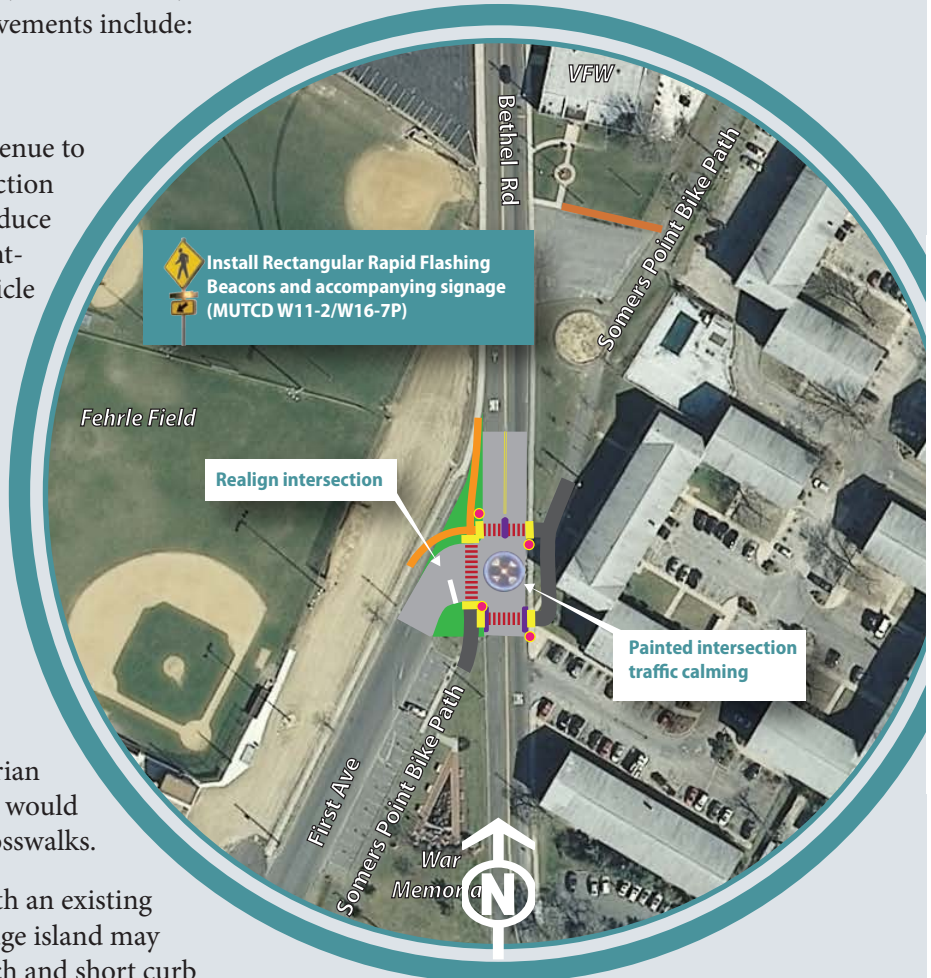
| Bethel Road at First Avenue / Somers Point Bike Path
